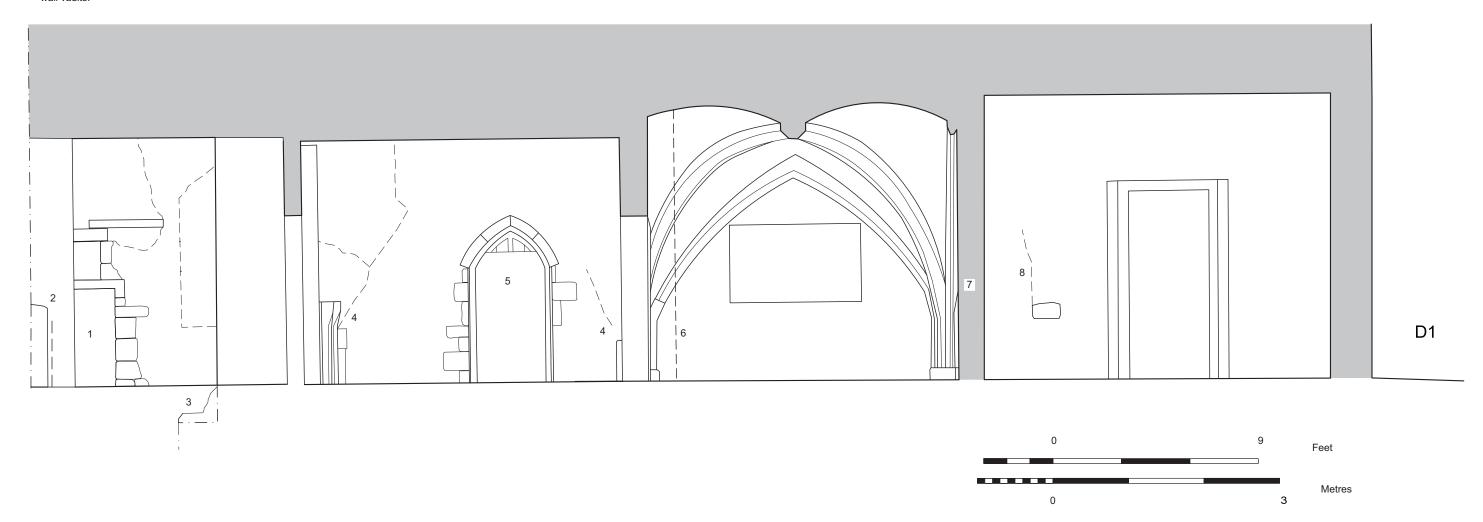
Sectional Elevation D - D1. East facing. Print Scale 1:50
